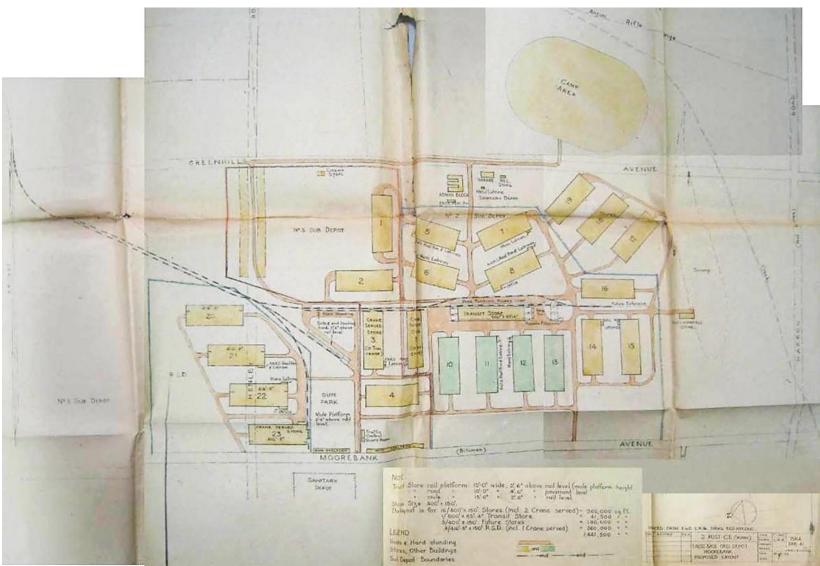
Plan of proposed layout of Moorebank Ordnance Depot 25/4/44 (Source: NAA: SP459/1, 420/7/1153)
